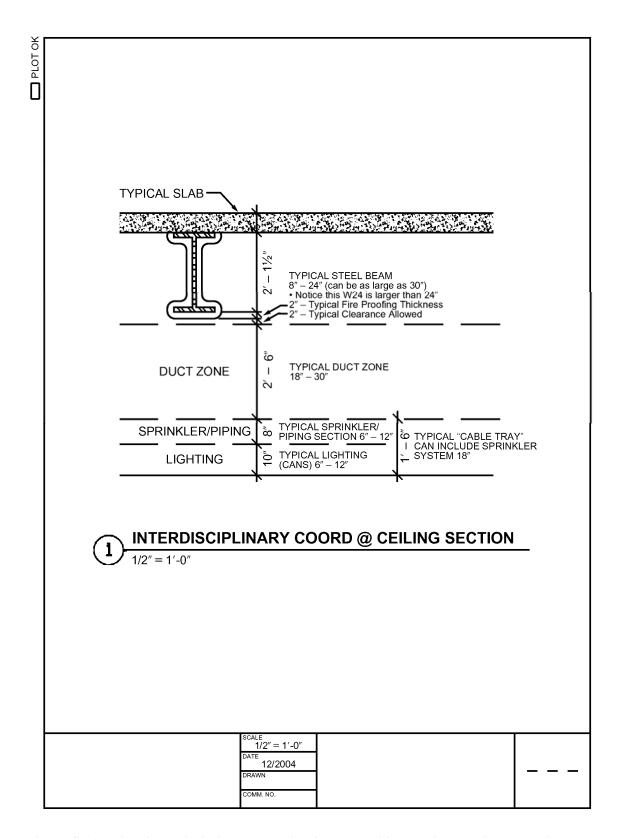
Typical interdisciplinary coordination and ceiling section detail on drawings.
